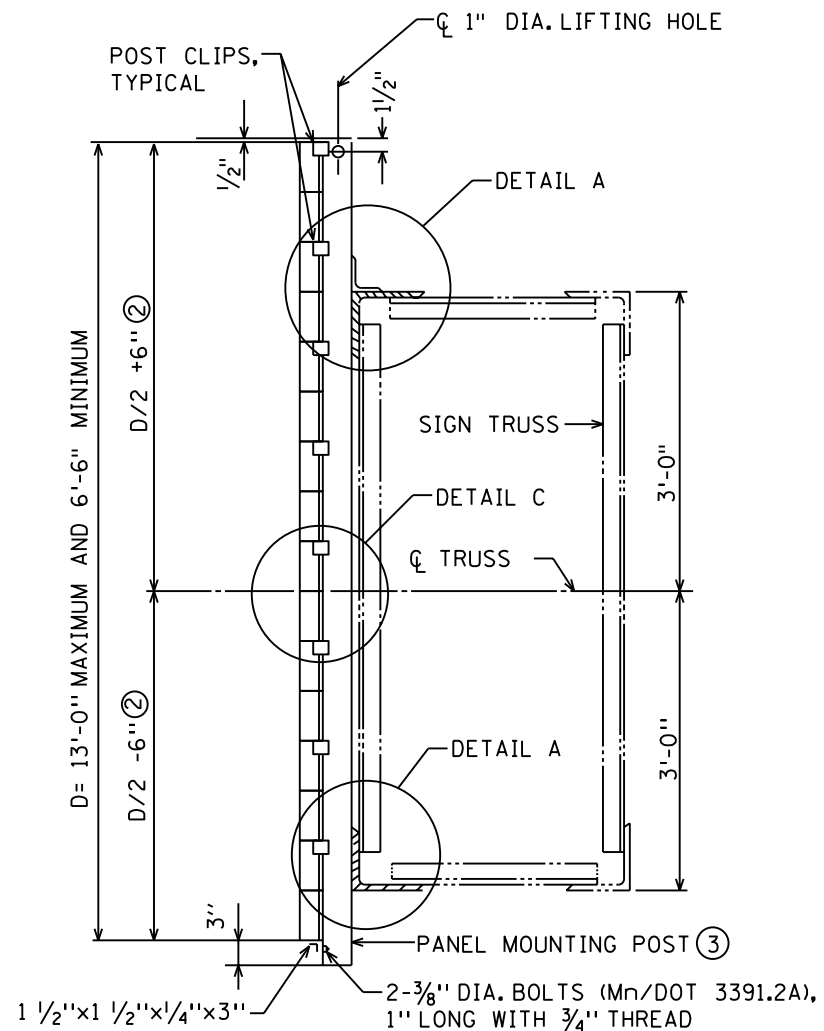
DETAILS SHOWN ARE FOR THE FREE ENDS OF THE CANTILEVER SPANS. ALL OTHER DETAILS FOR CANTILEVER TRUSSES SHALL BE AS SHOWN FOR THE SIMPLE SPANS.
